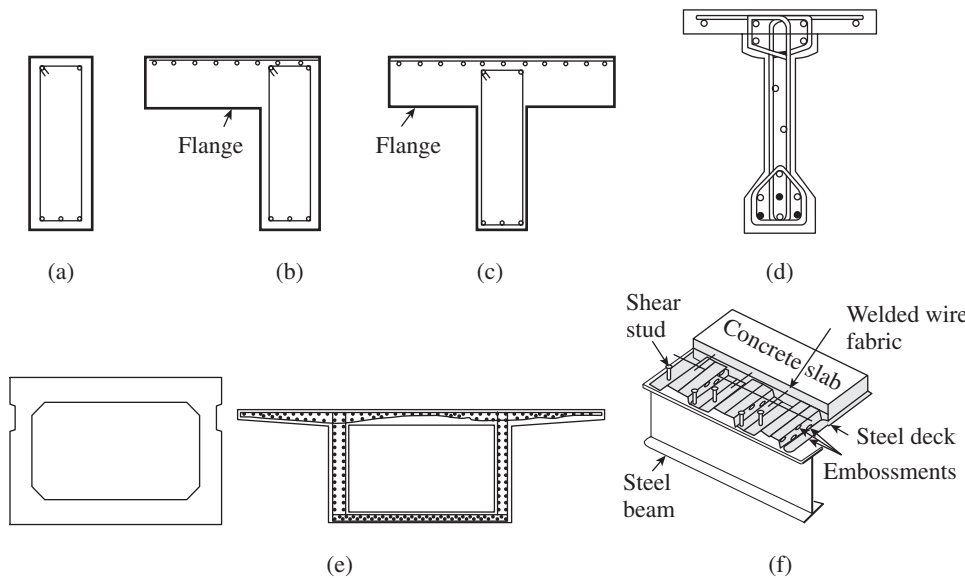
Different types of beams (a) Rectangular (b) L-section (c) T-section (d) I-section (e) Box section (f) Steel–Concrete composite beam
